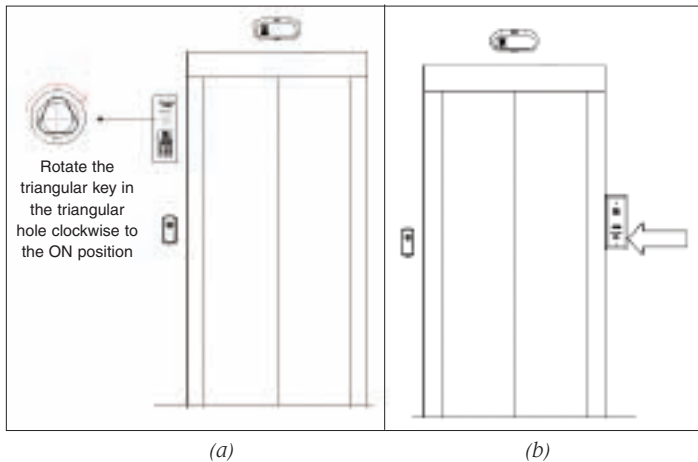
(a) Elevator evacuation control switch at the main exit floor (along with master station of elevator evacuation communication system) (Courtesy: Drucegrove, the U.K.); (b) Slave station of elevator evacuation communication system at upper floors.
